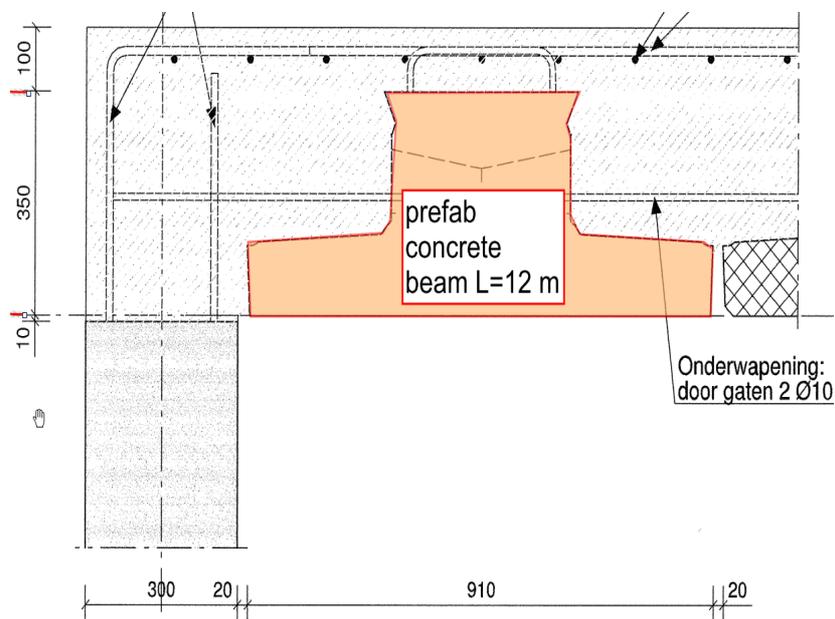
Detail inner roof small pop hall (12,5 x 24 m)
